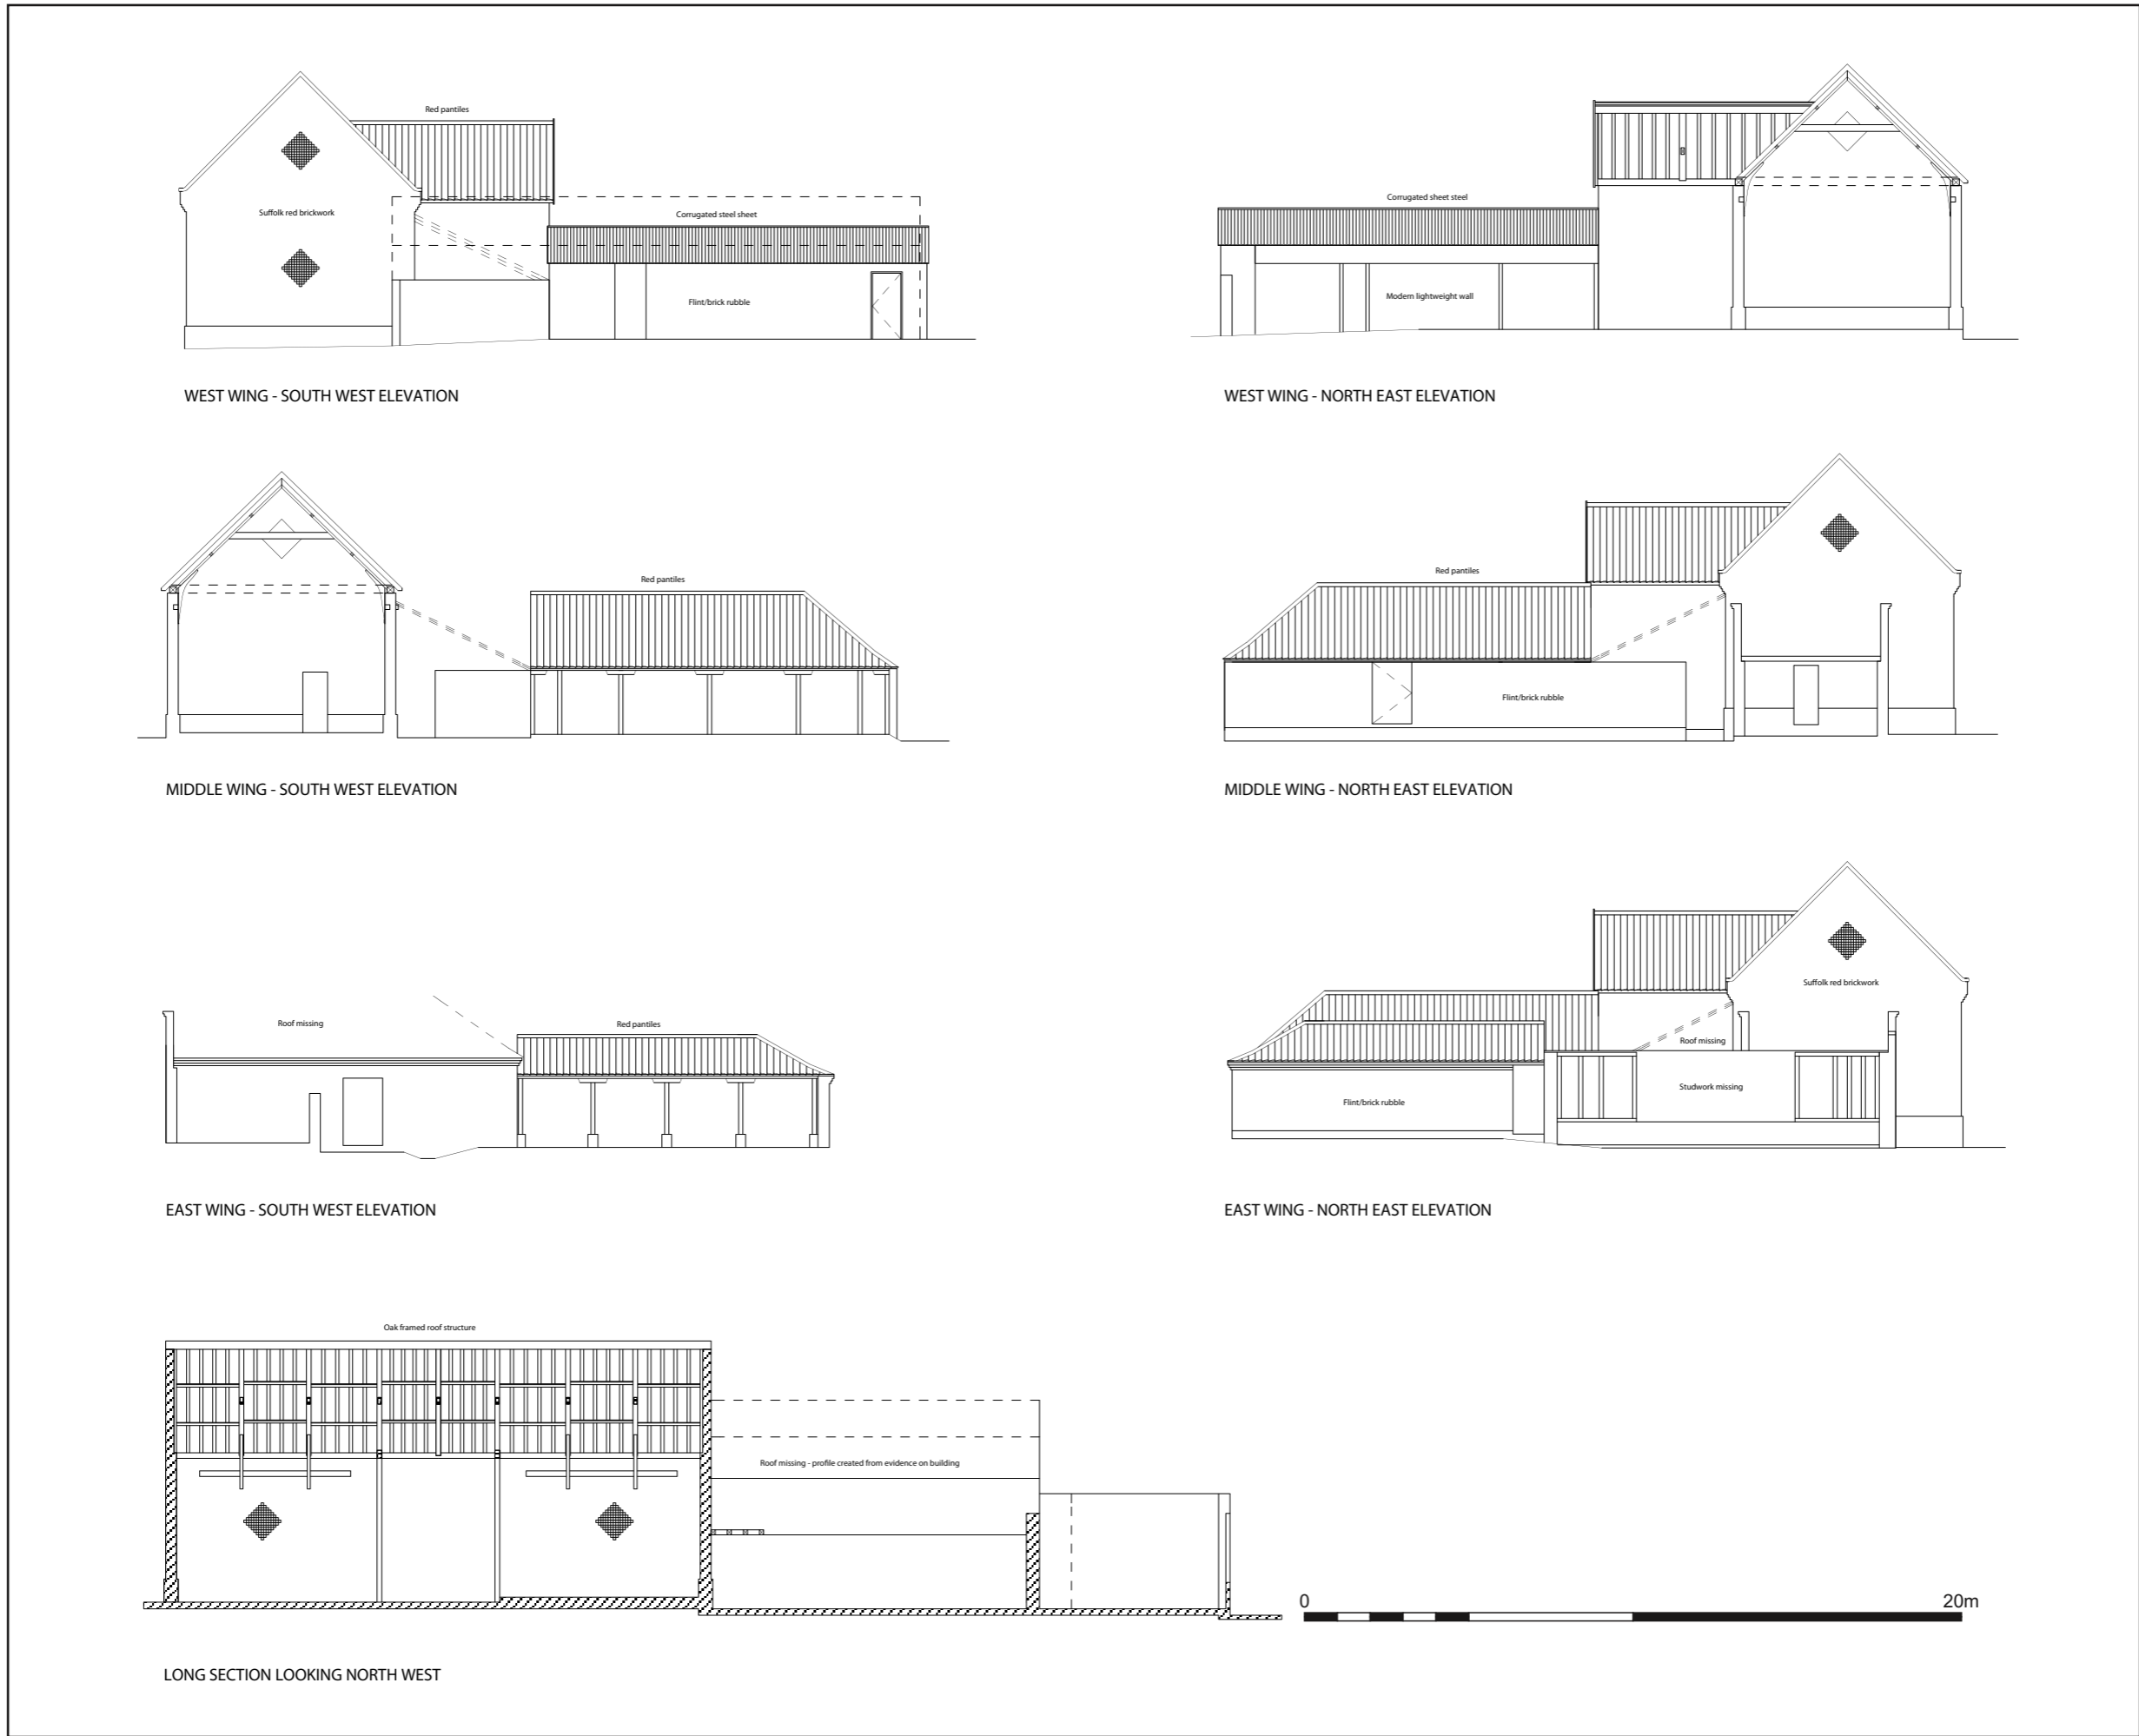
Elevations of barn buildings as existing (courtesy of Elmbid Ltd, drawing no. 107/02). Scale 1:200 (at A3)
